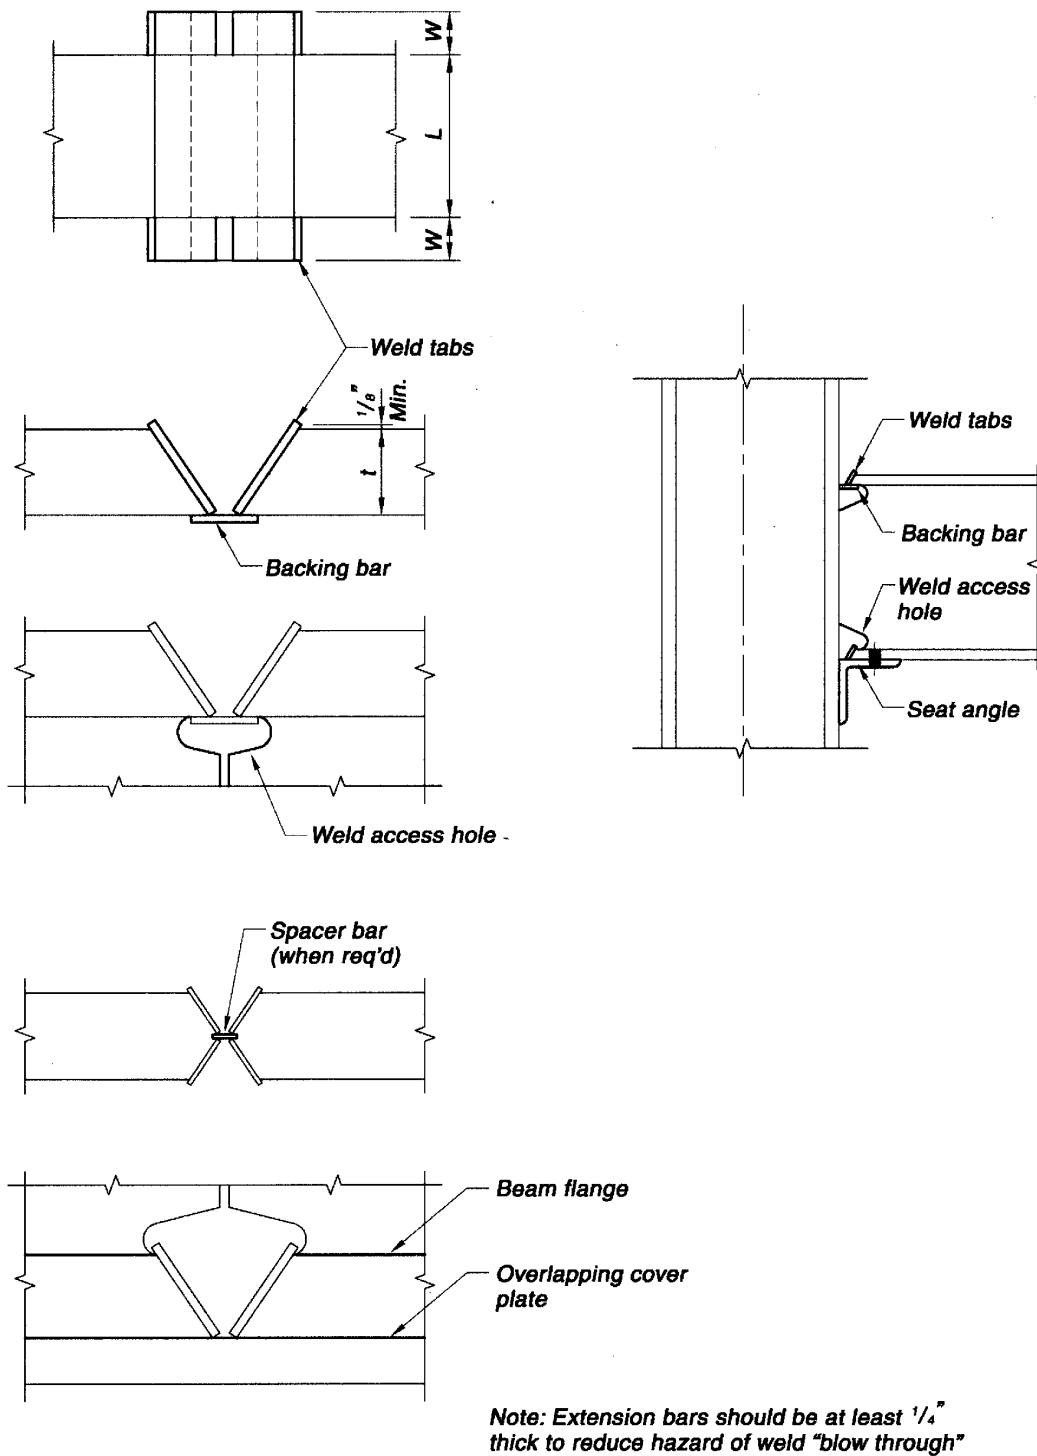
Illustration of backing bars, spacer bars, weld tabs, and other fittings for welding.
